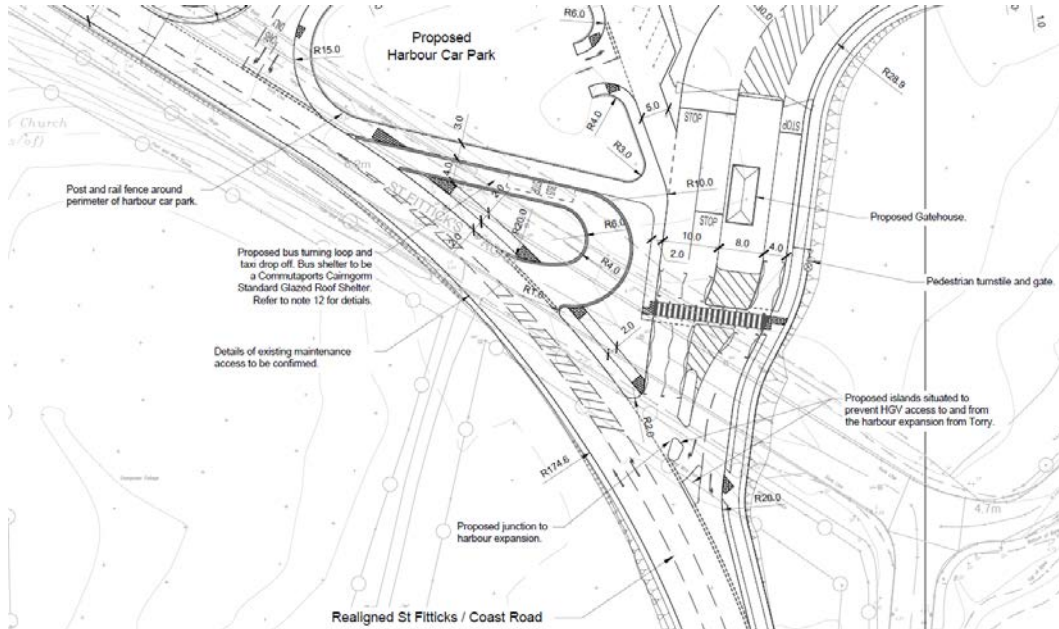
Road Layout drawing highlighting the proposed traffic islands
